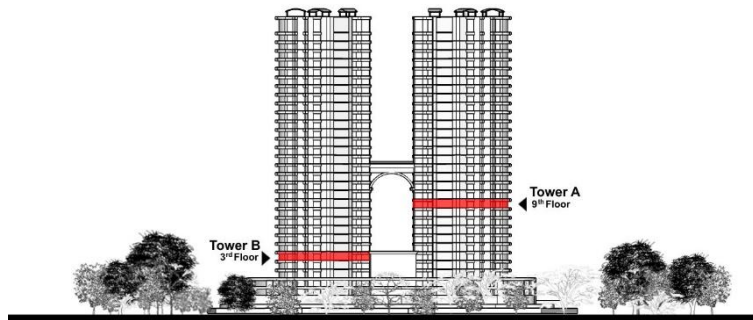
Schematic elevation of The View Towers with study units at both towers indicated.
